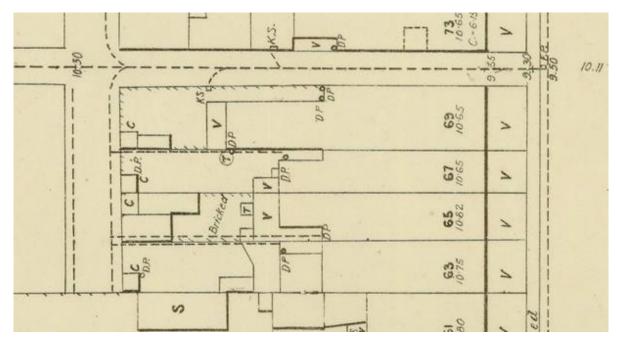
MMBW detail plan 328, Port Melbourne, 1895, showing the shops at 63-69 Bay Street (now 79-85).
